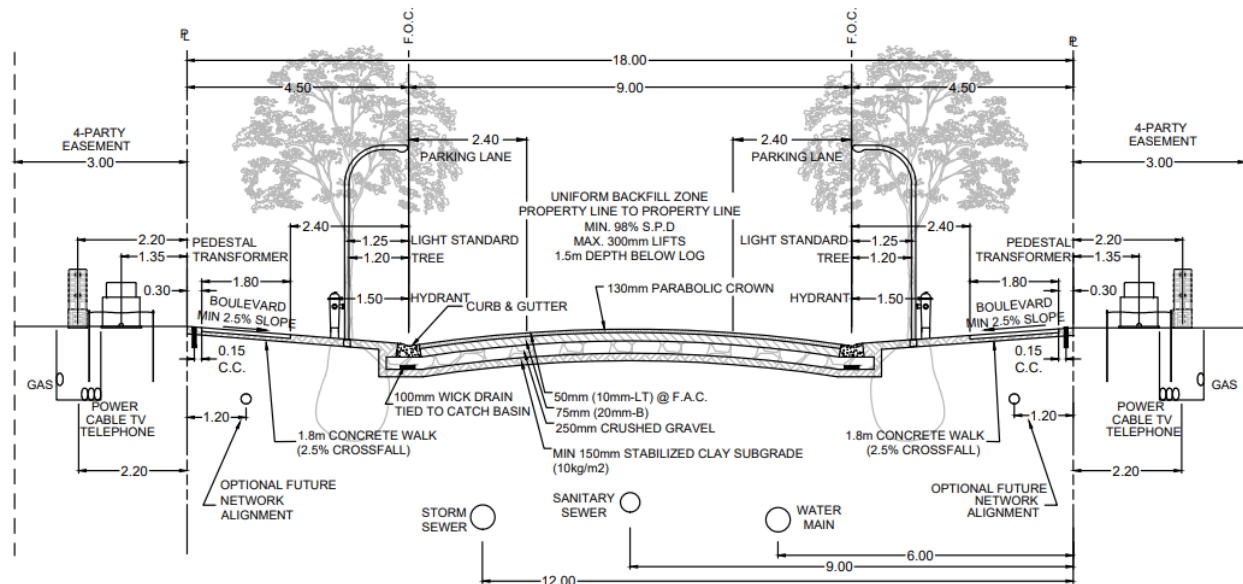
Local Roads Cross Section, St. Albert Engineering Standards
